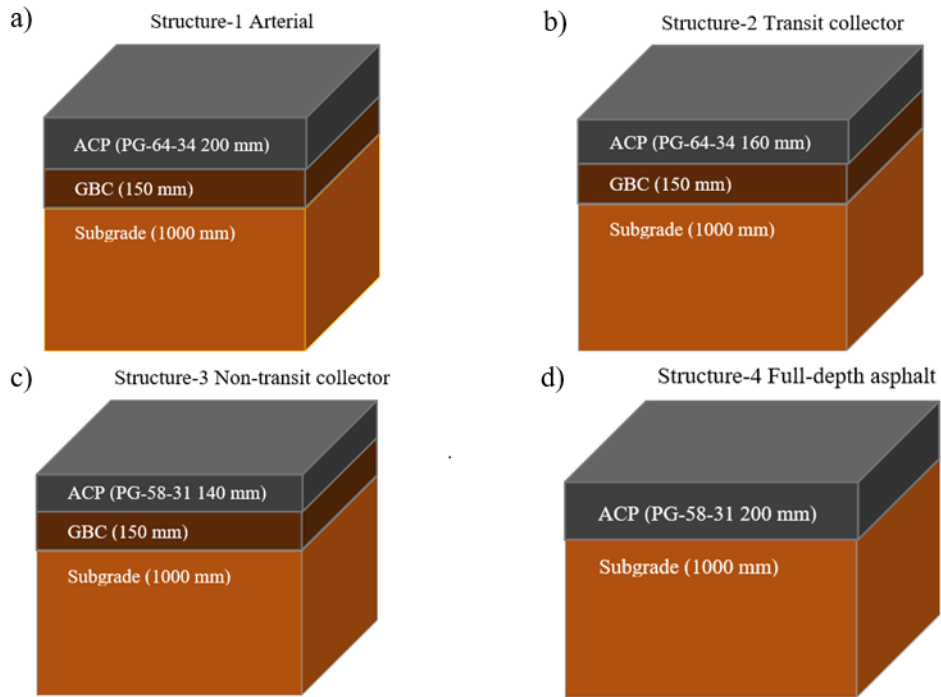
Schematic illustration of pavement structures used in the FE modelling including (a) arterial section, (b) transit collector section, (c) non-transit collector section, and (d) full-depth asphalt
